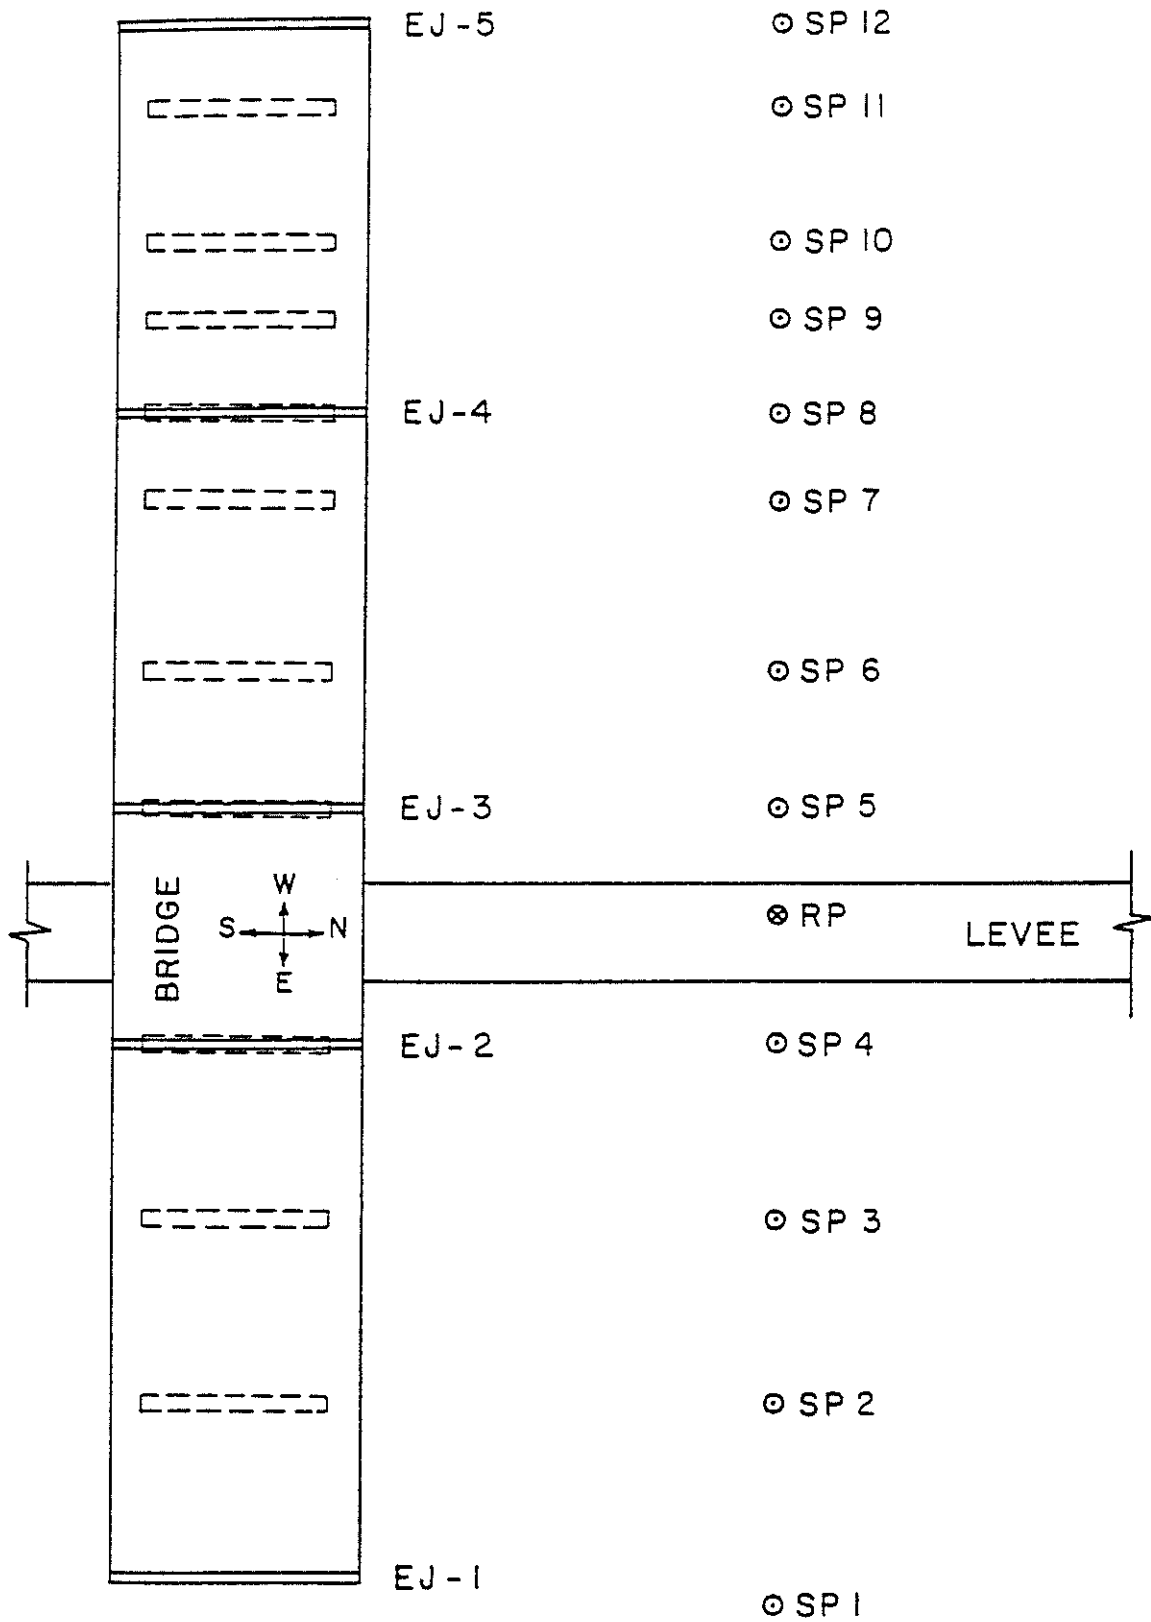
Plan View of Bridge Showing Theodolite Setup and Reference Points.
